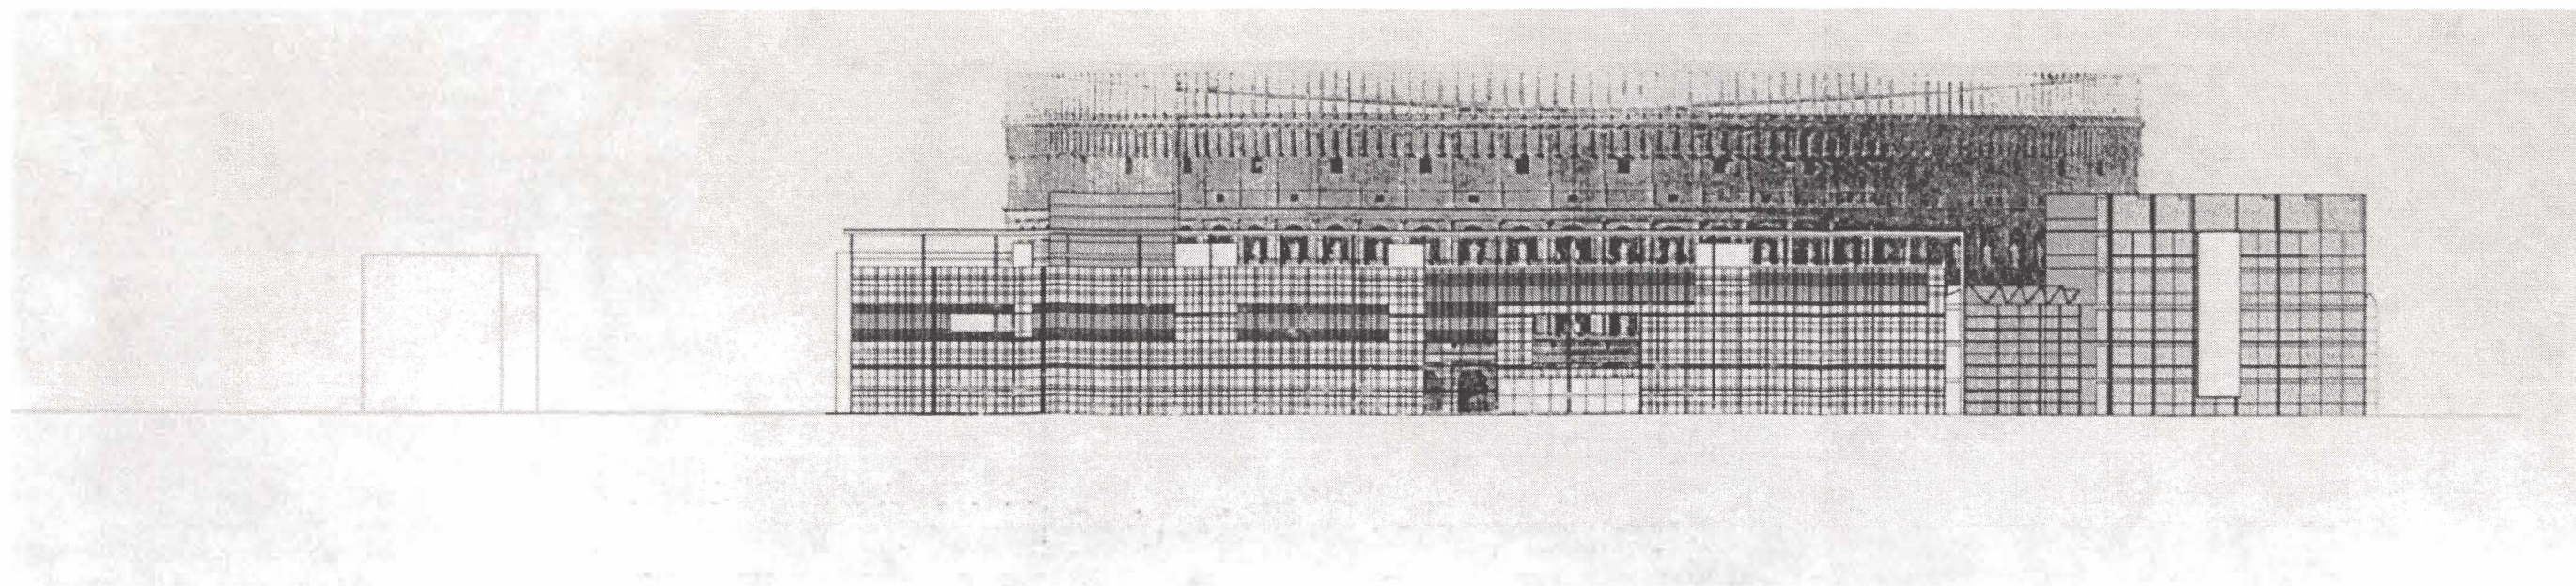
, *SERVICE BUILDING ELEVATION
